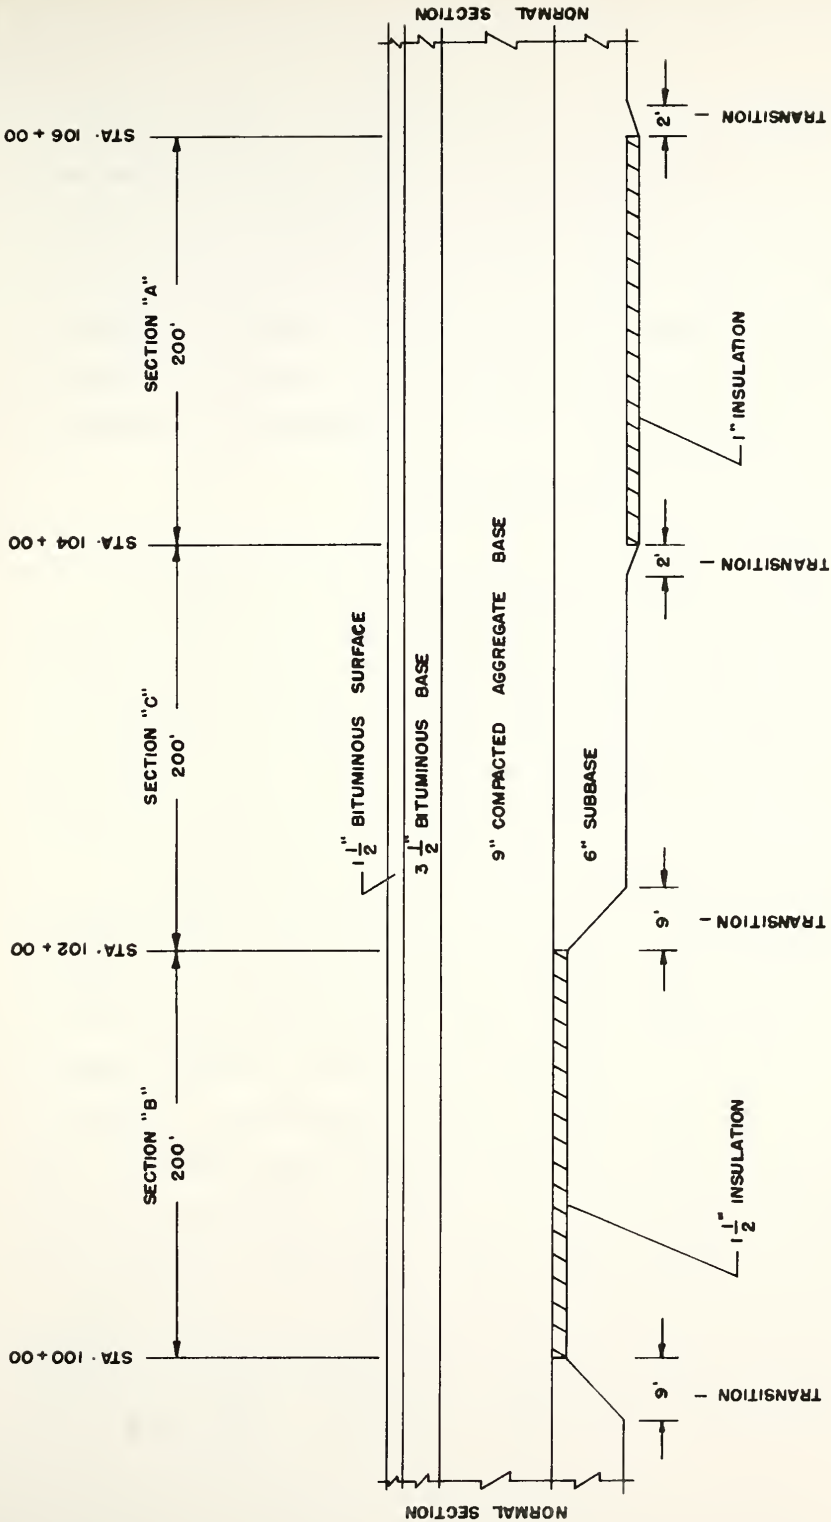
PLAN OF FIELD TEST INSTALLATION
